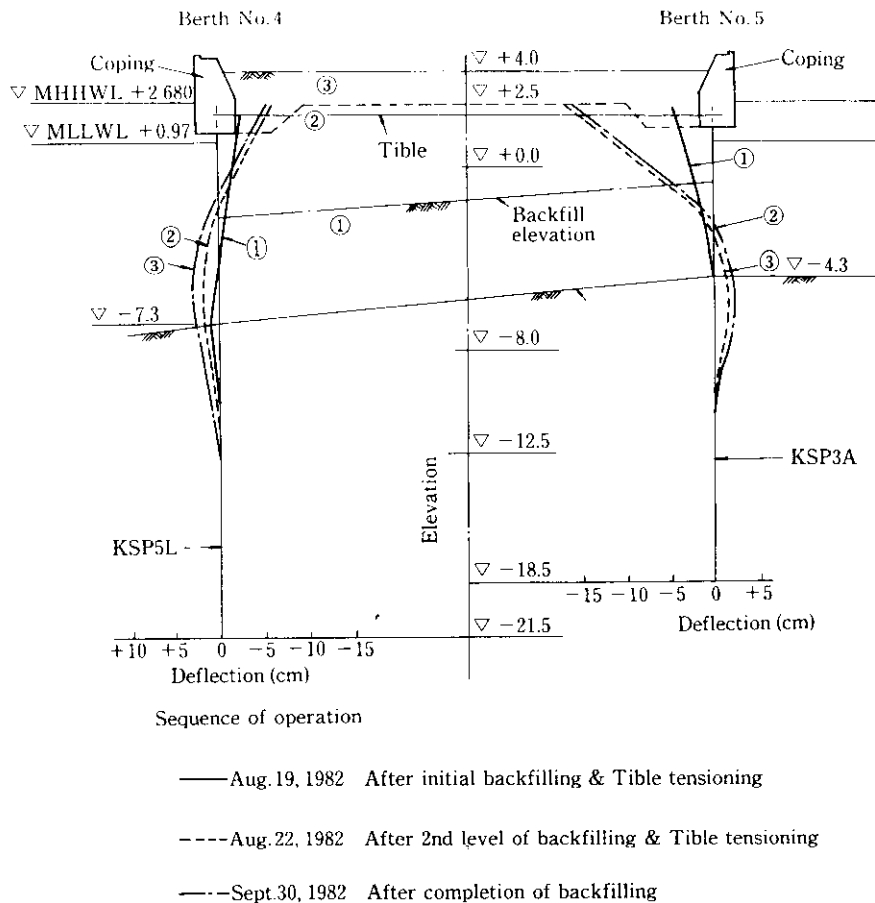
Deflection of sheet pile and Tible tension of sheet pile double wall structure
